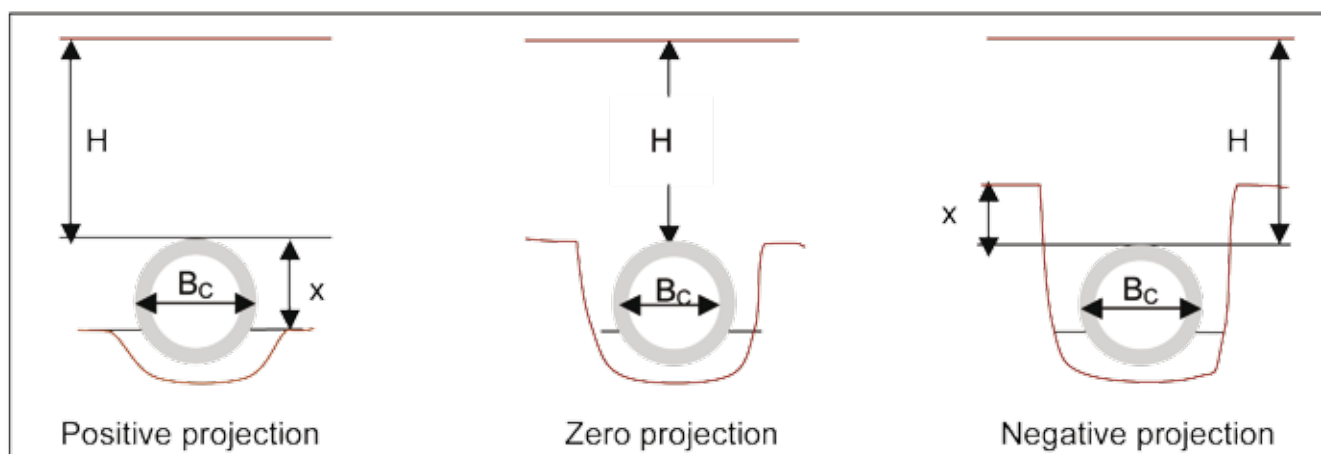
TYPES OF EMBANKMENT INSTALLATION
